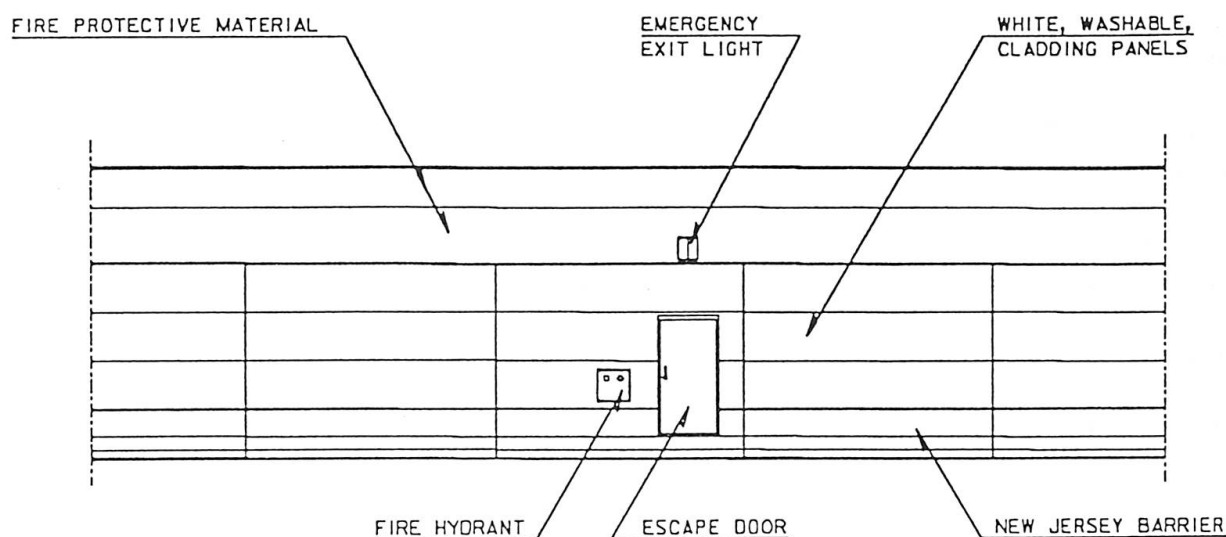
Longitudinal section of roadway tunnel, showing the wall to the escape gallery
